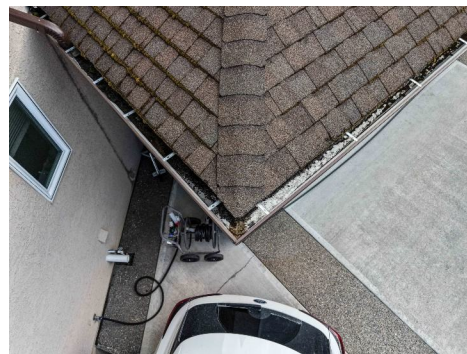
Detail 2 — Drainage / Gutters and Downspouts, North.
